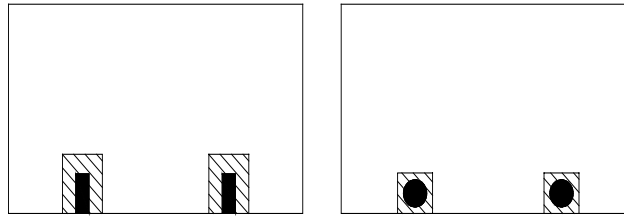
Near surface mounted FRP, rectangular shapes and rods
